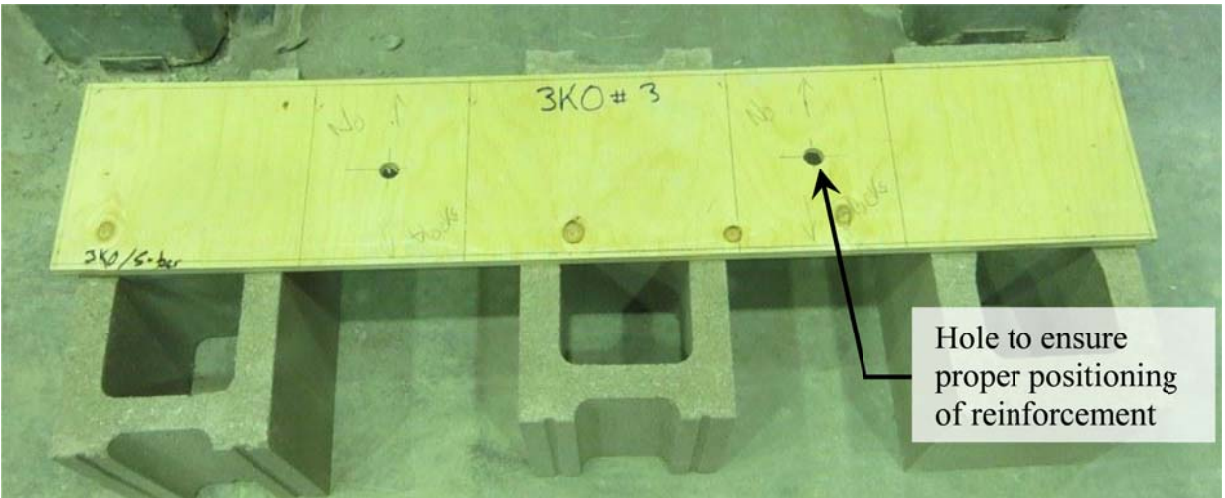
Base Used to Construct Wall Splice Specimens.
